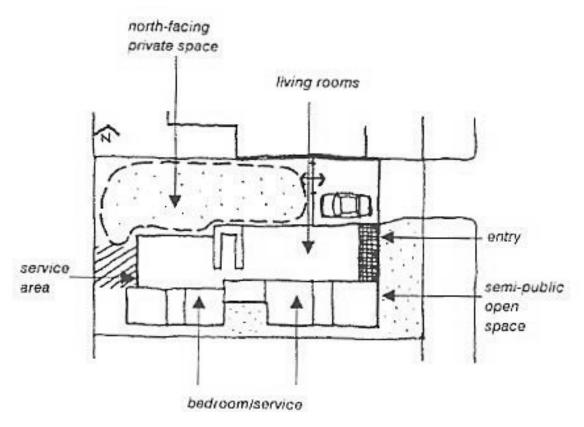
Sample dwelling floor plan. Source - AMCORD
